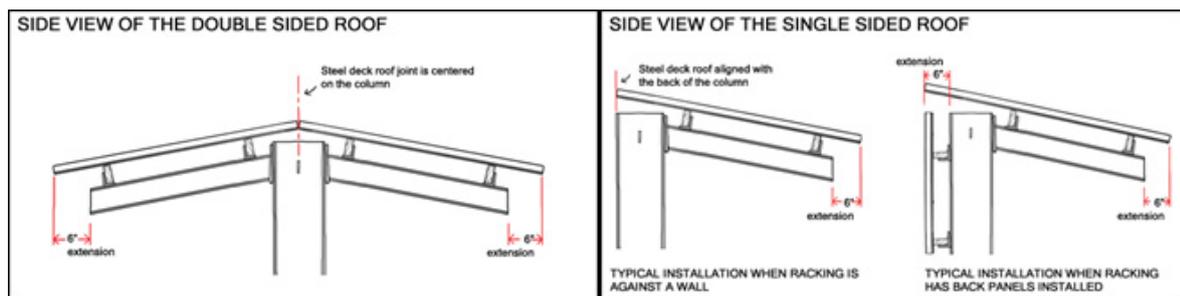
Cross Sections of double roofing with double and single sided roofs (Image URL:http://www.cogan.com/Products/Racking/Roofing_System/Product_Details.aspx)
